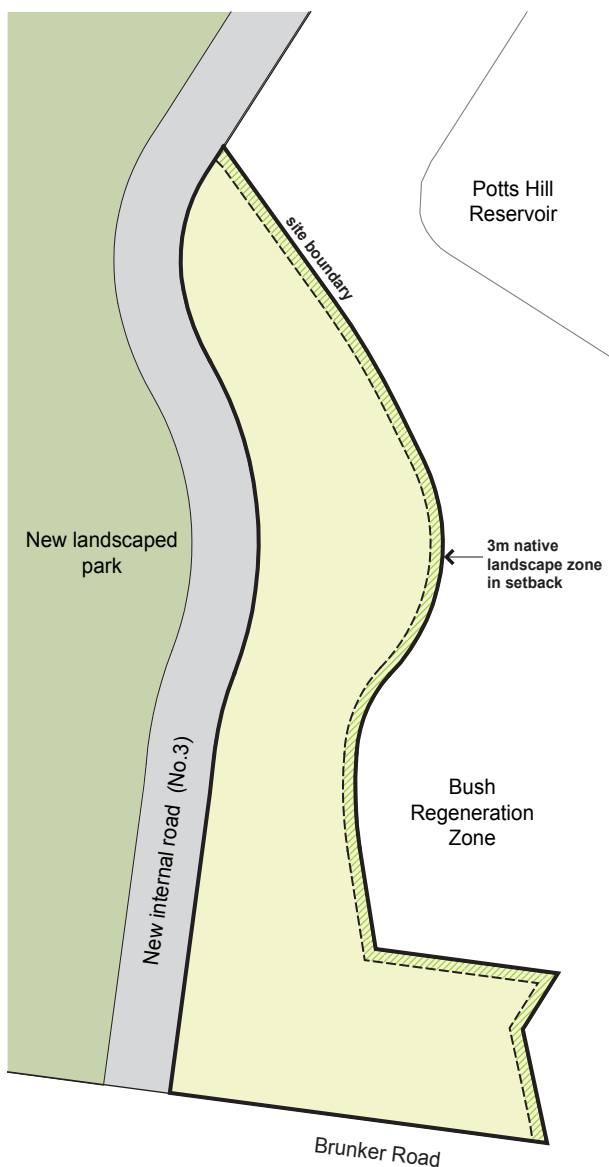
Built Form Control Plan - Brunker Road Apartments
